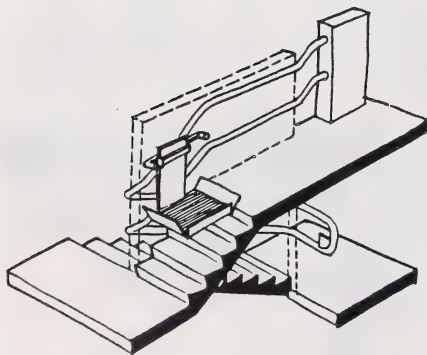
PLAN OF WHEELCHAIR ELEVATOR FOR MAIN ENTRANCE TO A TYPICAL HOME
